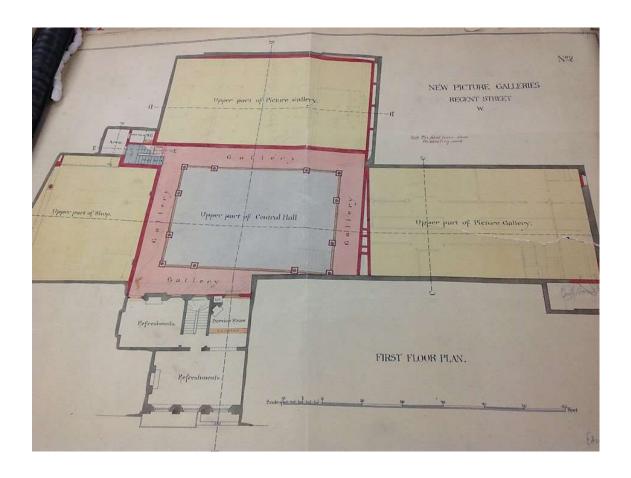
EDWARD R. ROBSON, FIRST FLOOR PLAN, NEW GALLERY, 1888. NATIONAL ARCHIVES. Photograph taken by D. Innes.
